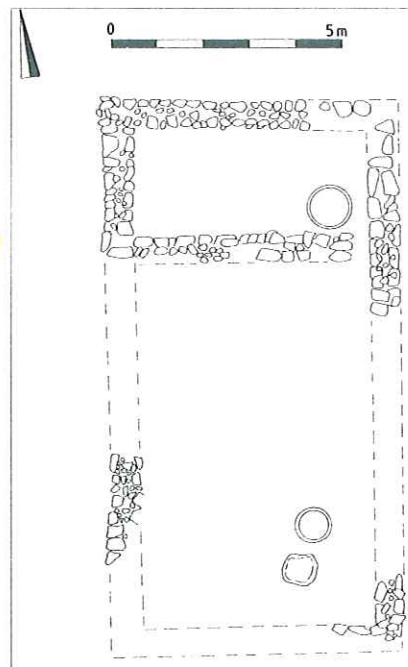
Miletus, plan of House B of the second building period (after Mallwitz 1959/60, with addition)
